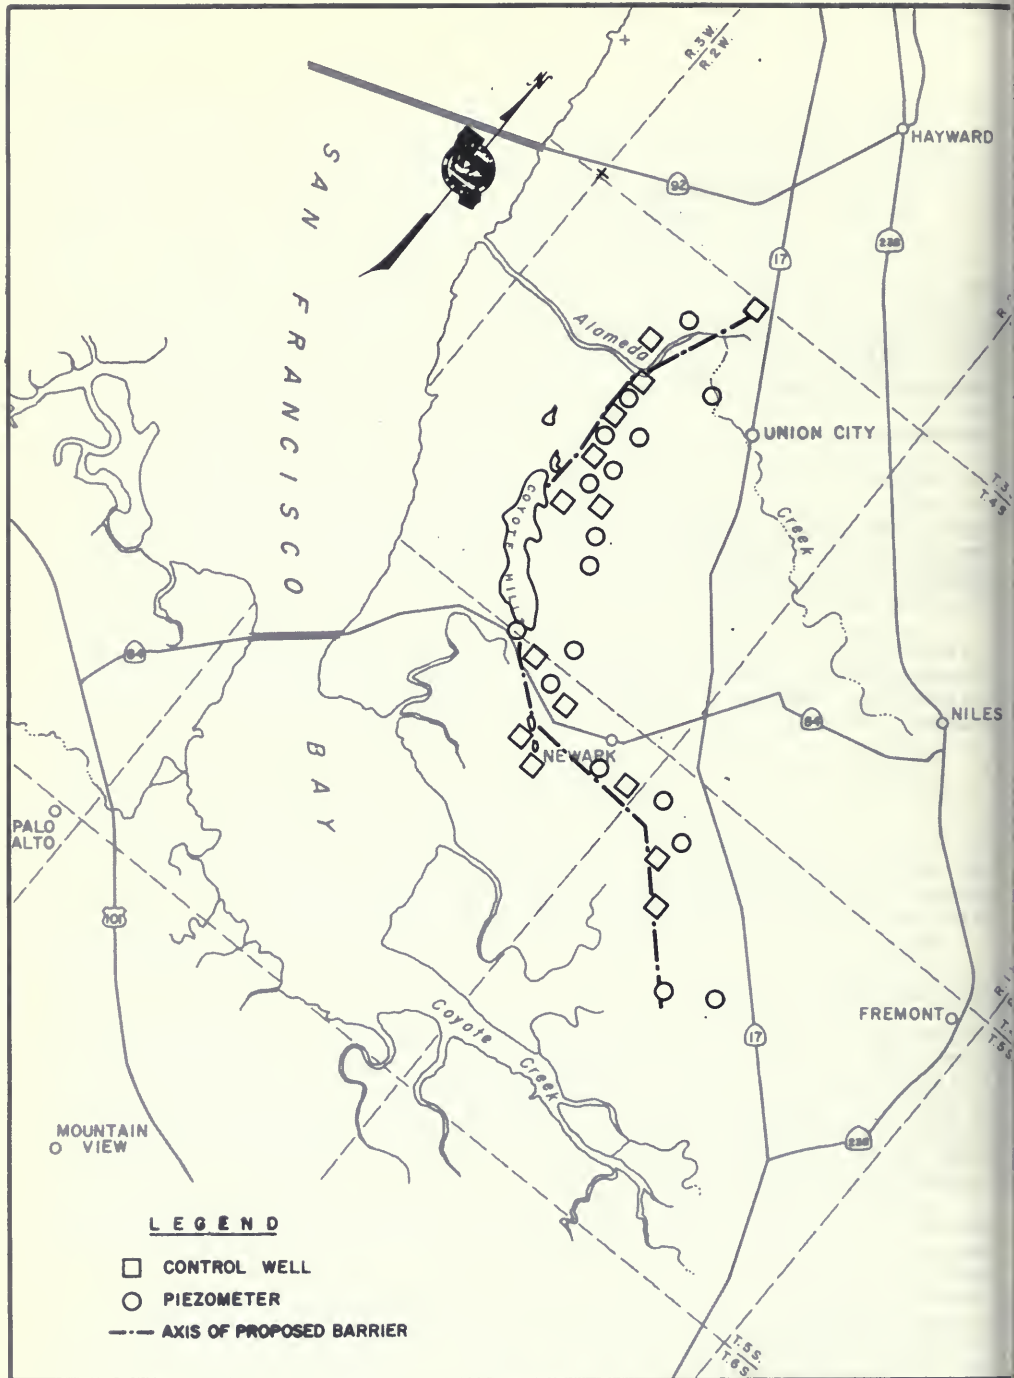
CONCEPTUAL PLAN FOR PROPOSED BARRIER
